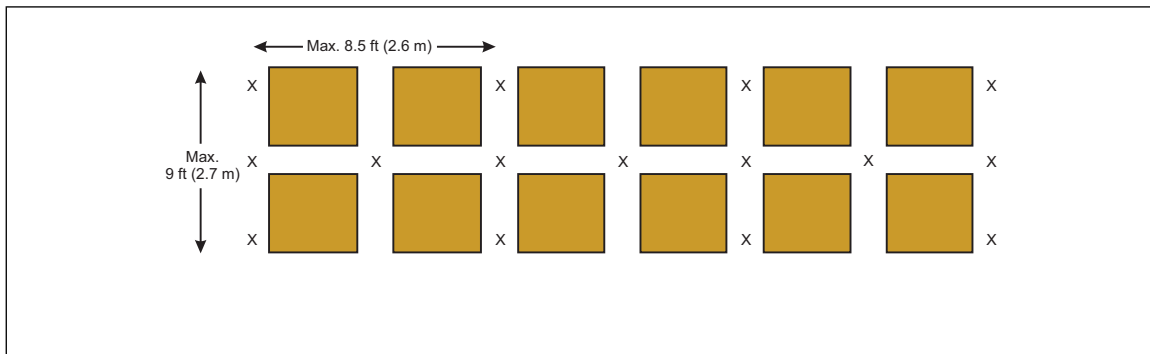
Plan view of alternative in-rack sprinkler arrangement for double-row racks up to 9 ft (2.7 m) deep
